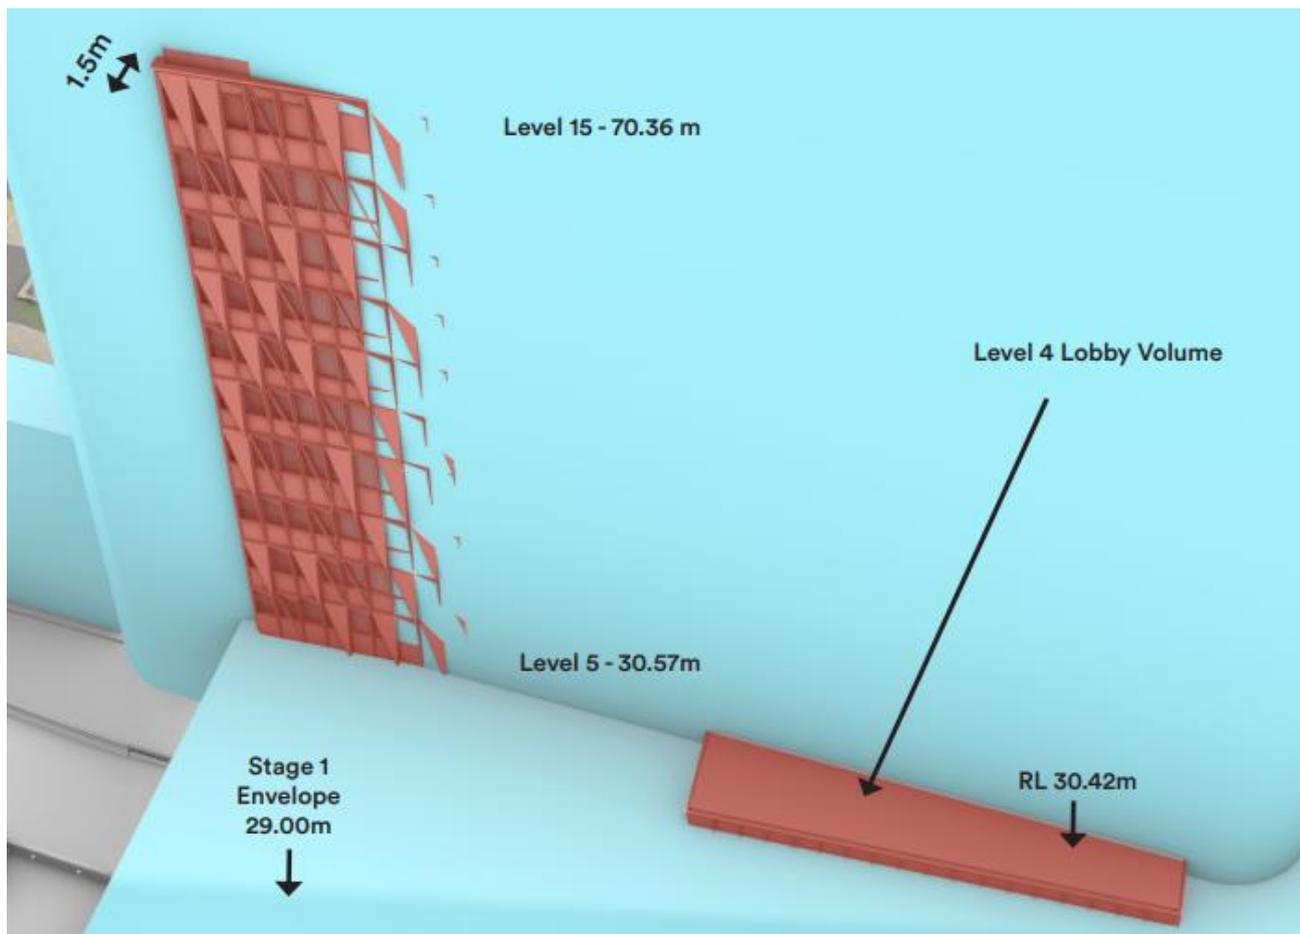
Detailed elements of the eastern façade (as part of the concurrent Stage 2 application) that require modifications to the approved envelope
